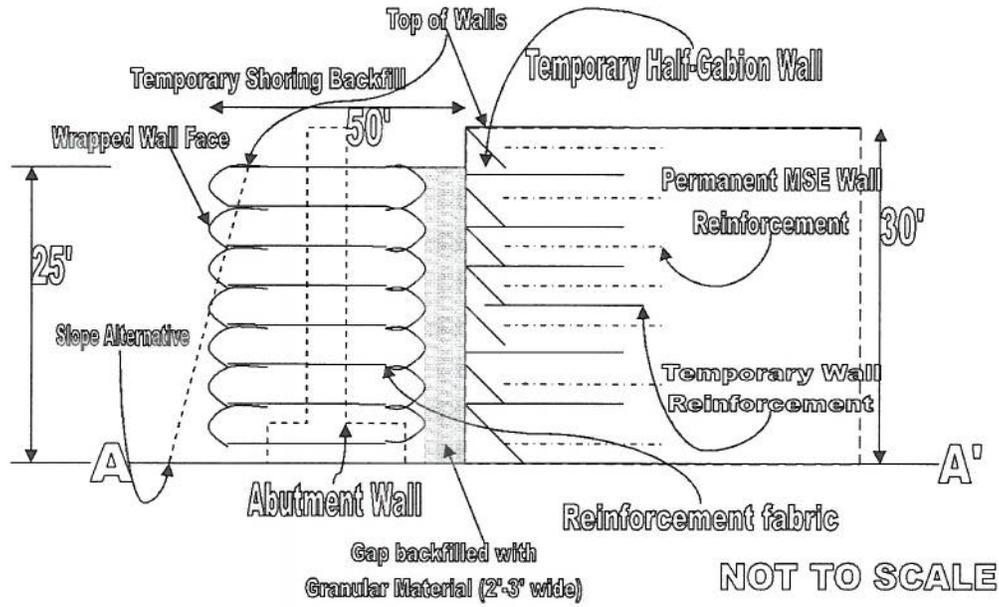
A cross section across the temporary shoring backfill and the half gabion wall
